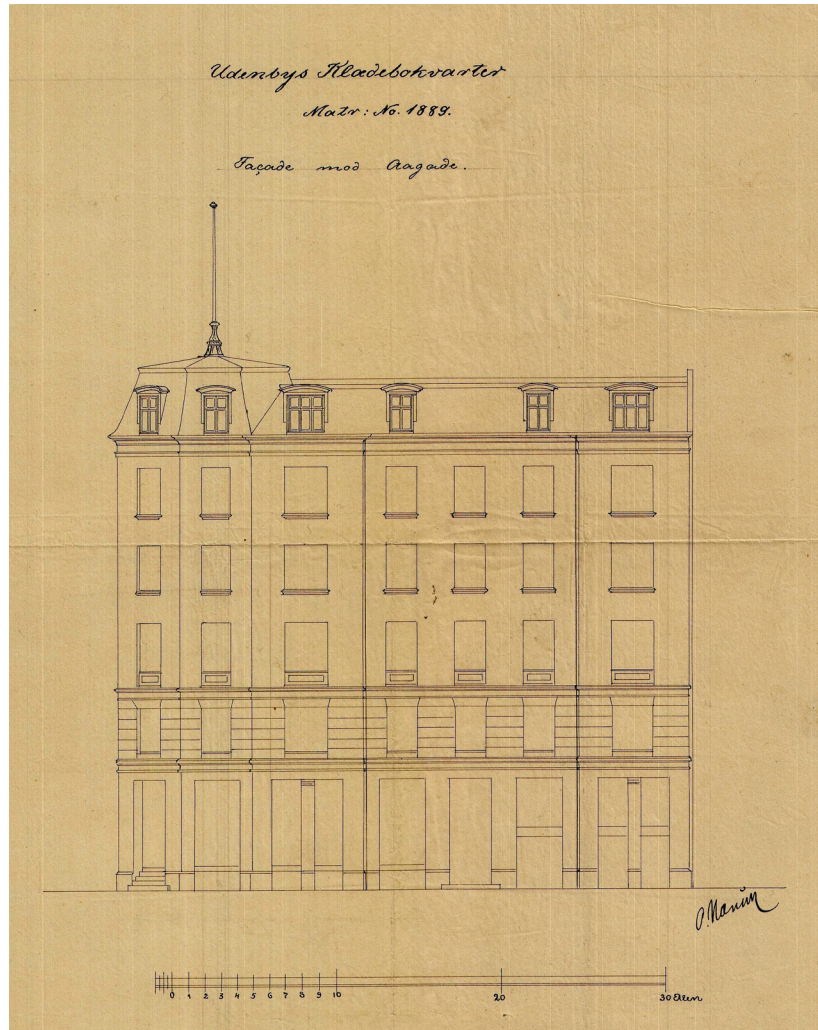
elevation ågade 110, 1888, architect mandrup-poulsen
